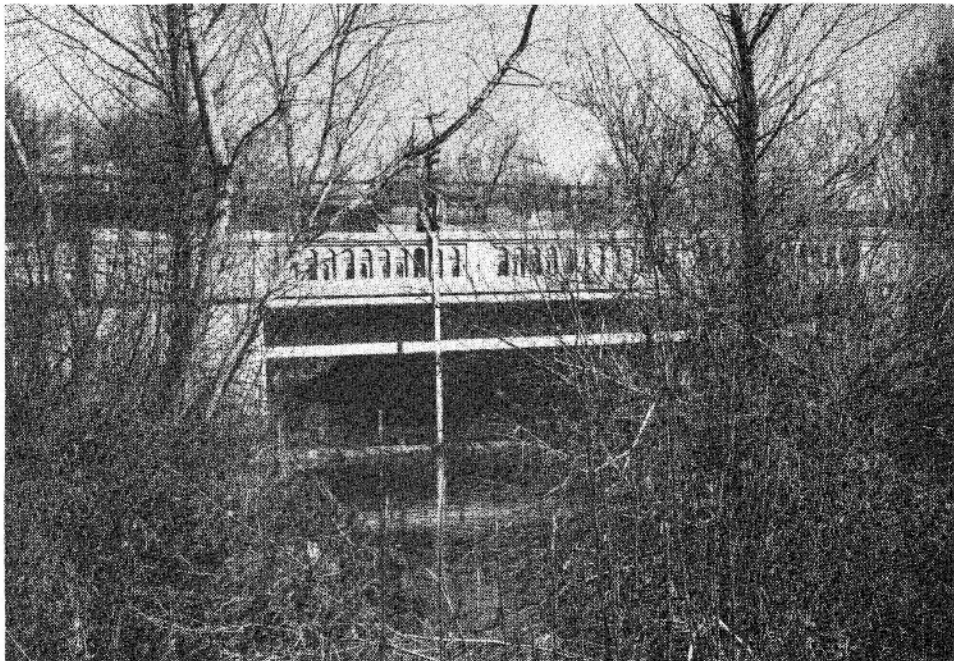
Southern Pacific Railroad crossing of Dry Creek immediately upstream from PFE Road.
